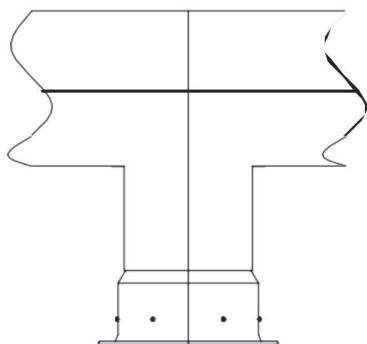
INSTALLATION ON DUCT WITH CONNECTING SLEEVE
